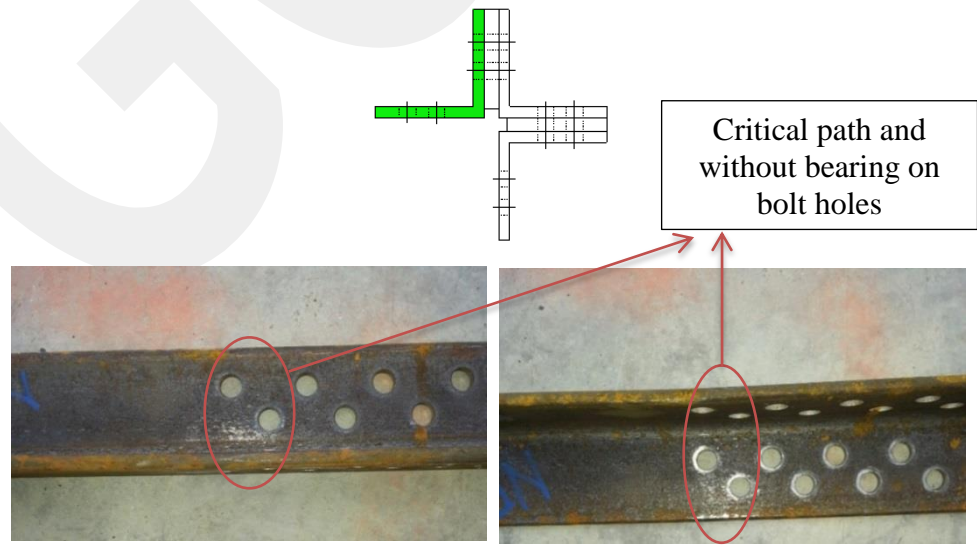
Bearing on lower main member 1 (Specimen-5)
